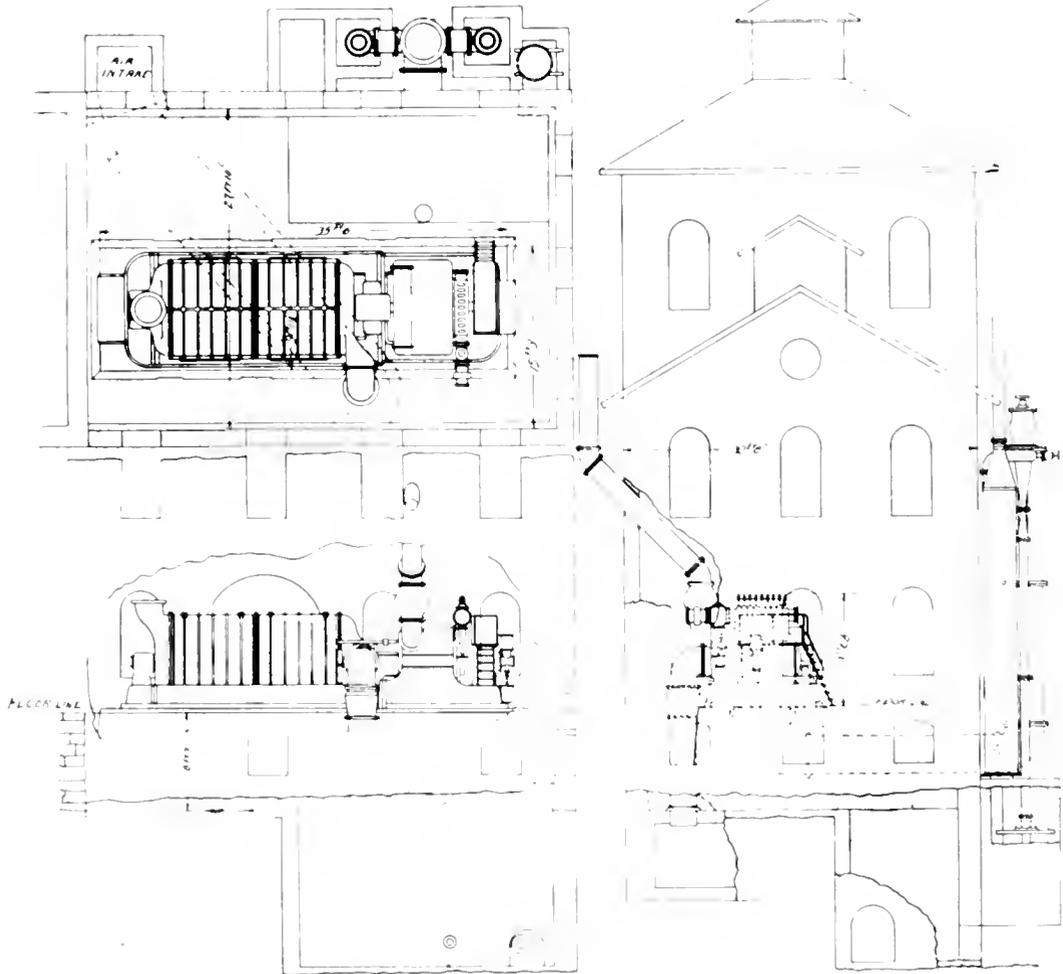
Elevation and Plan of Power House, showing Turbine Installed
